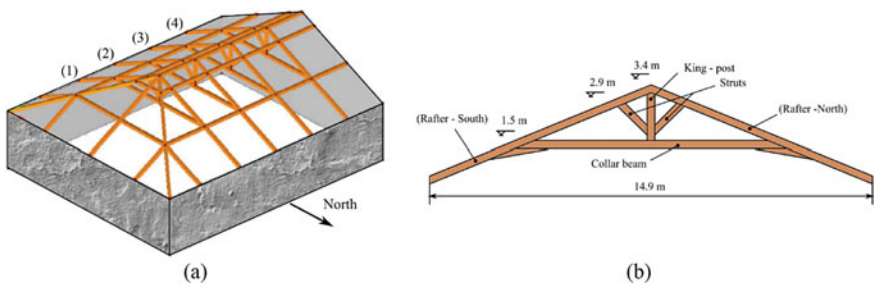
Timber roof: a three-dimensional perspective and b planar collar beam truss [7]
